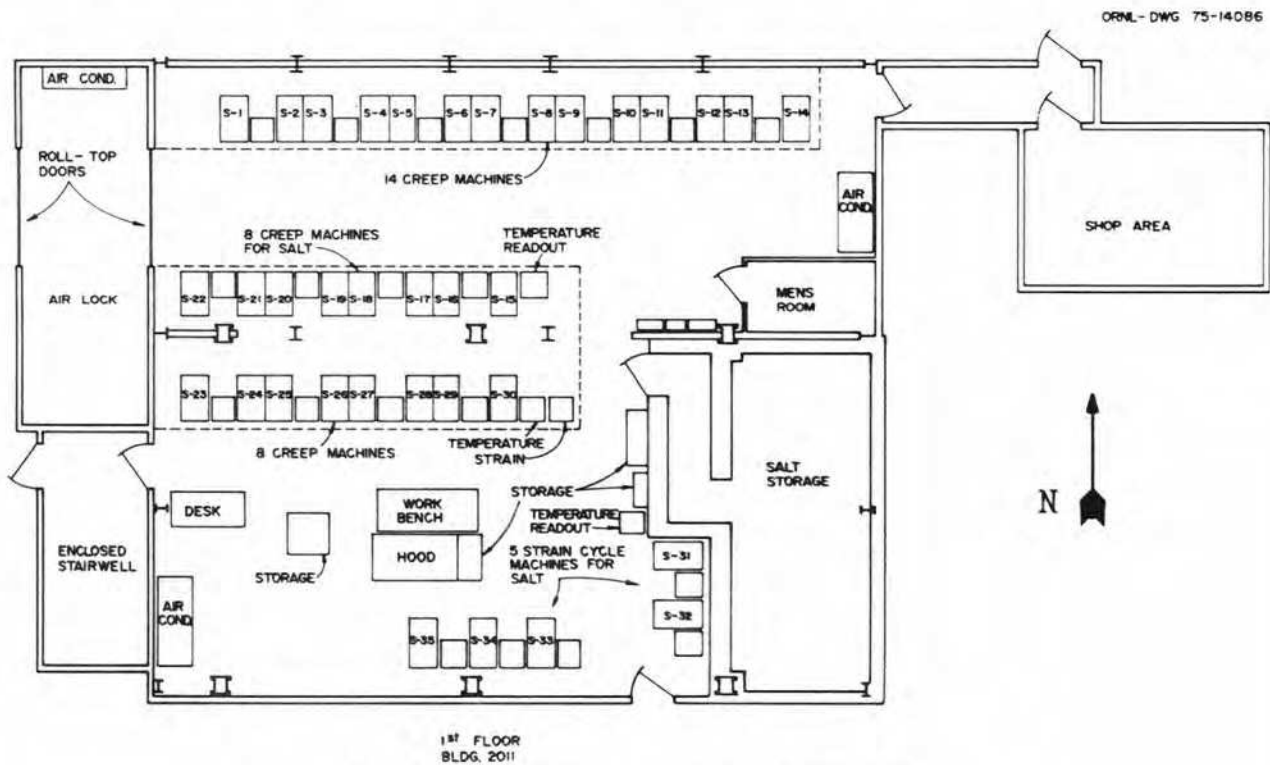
Equipment layout for the first floor of Building 2011.
